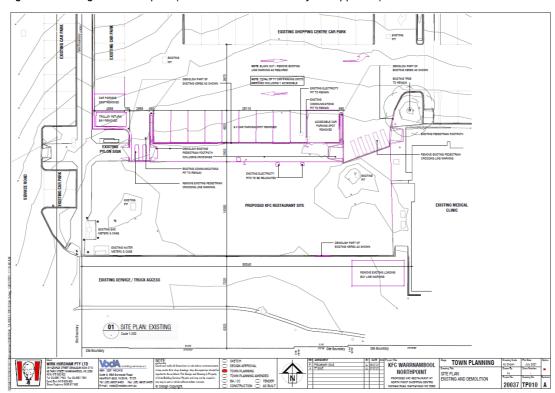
Existing conditions plan (Source: Plan submitted by the applicant)
